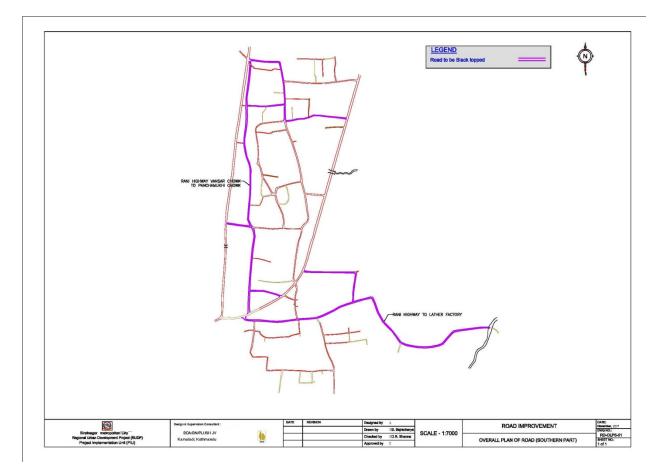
Overall Layout Plan of Road Improvement Networks (Southern part/rani area)
